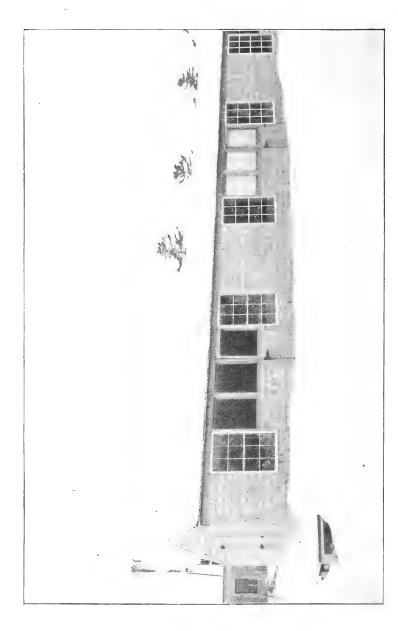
TWO SECTIONS OF CURTAIN FRONT HOUSE. Described on page 14.
